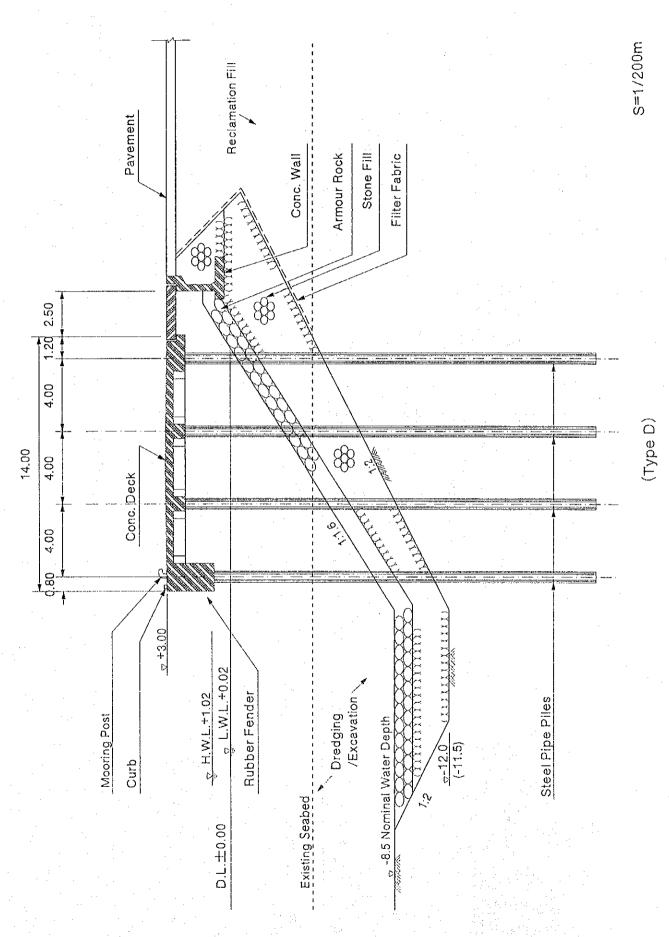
Typical cross section of berthing facilities (-8.5m Bulk cargo berth)
